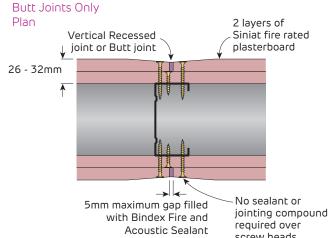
Vertical Joints in Double Layer Wall Systems
